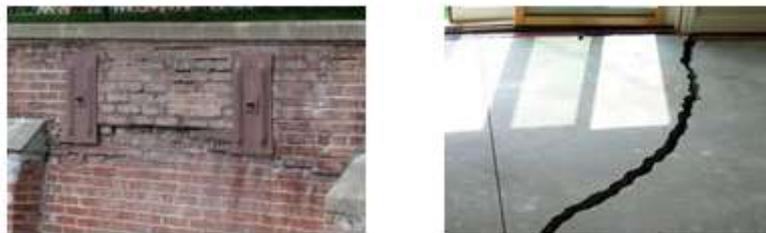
Views of cracks in exterior walls as a result of upward soil expansion
